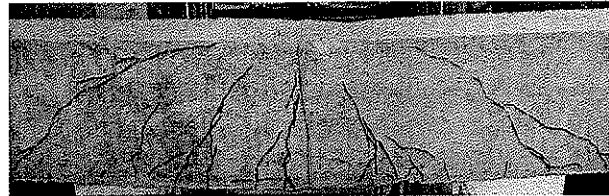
Crack Pattern of Sodium Chloride Specimen #2
